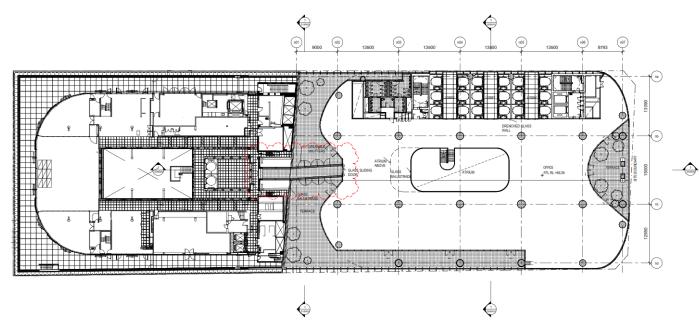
Proposed Level 10 Approved Bridge Realignment – General Arrangement
